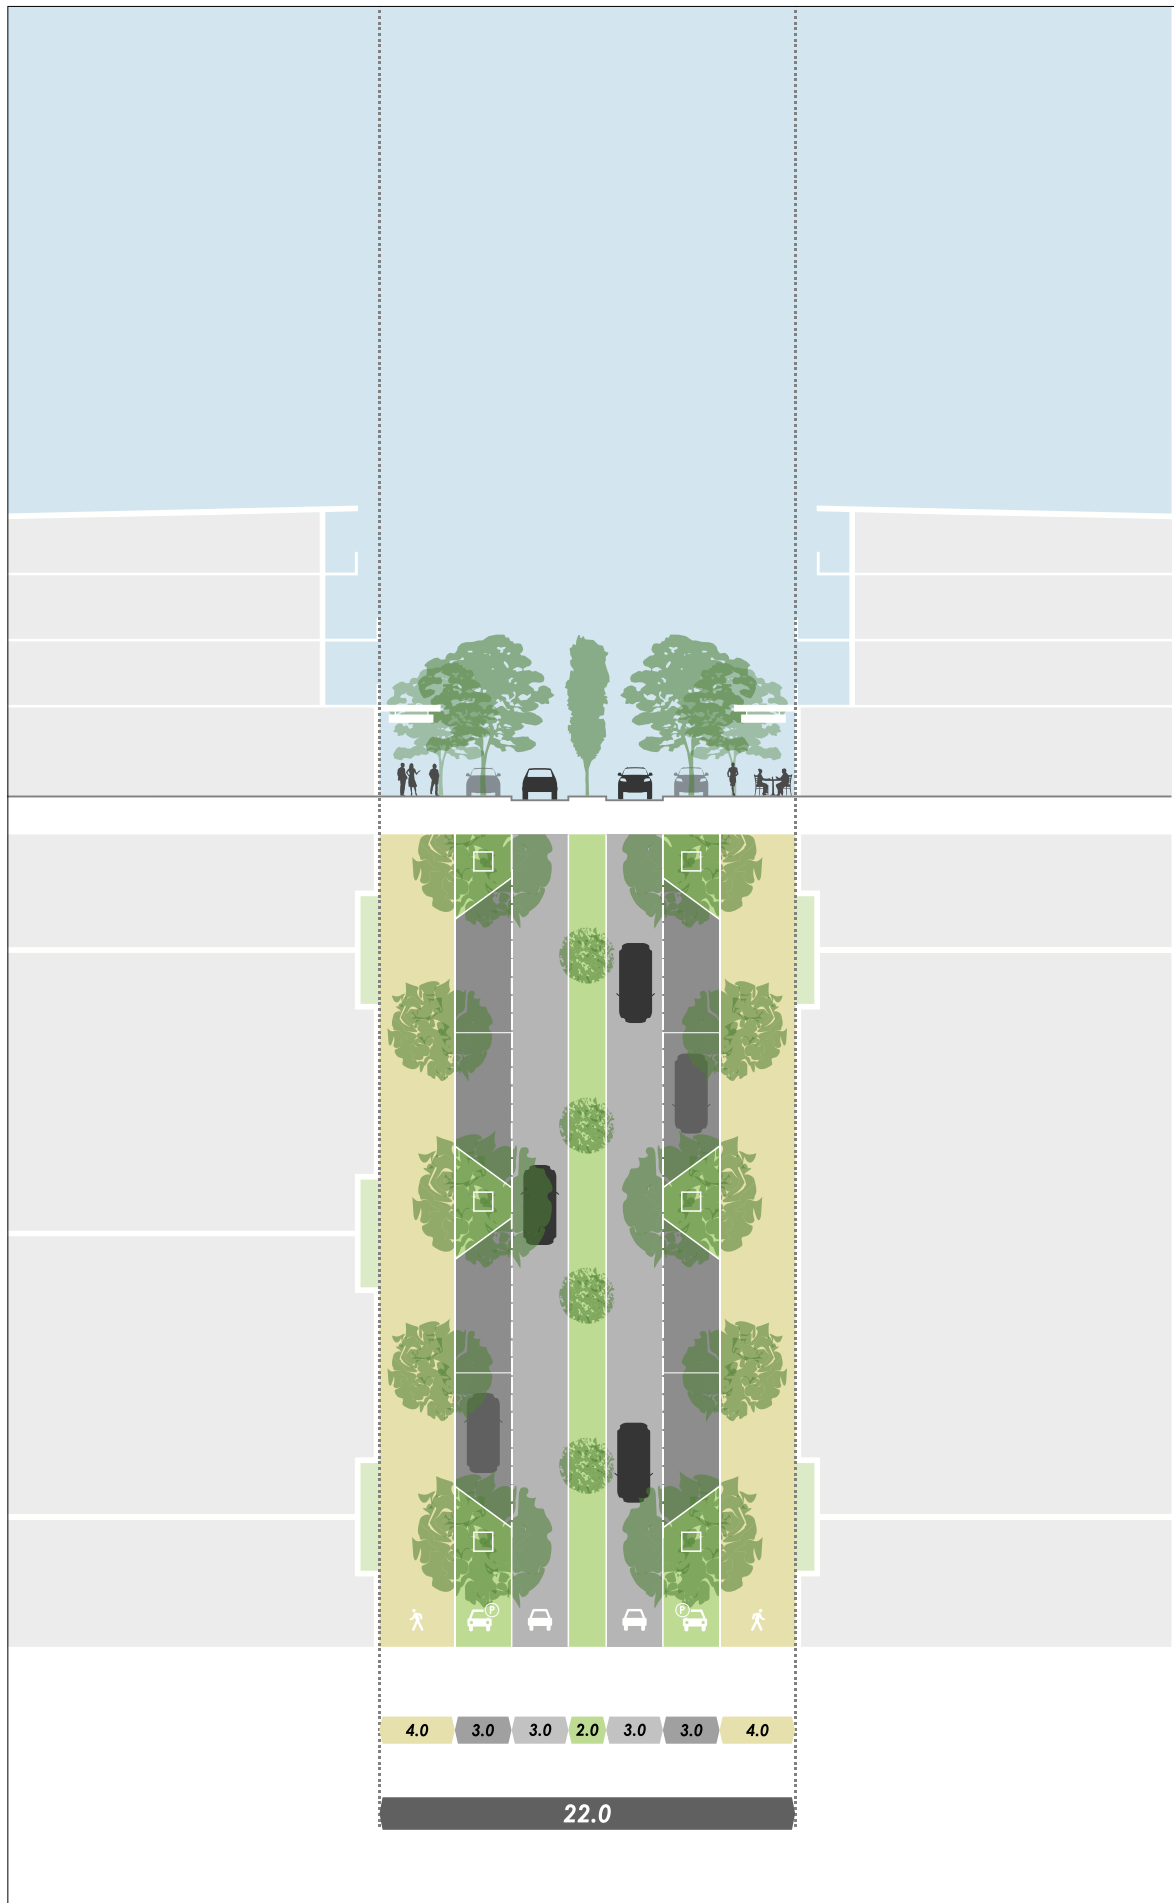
C - New Roads Cross Section - 20m - 22m - Stage 2
